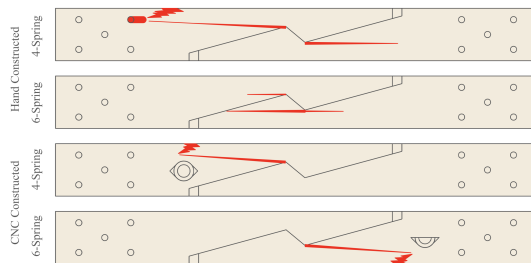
Schematic of the major crack patterns observed in the four tested daimochi tsugi joints (top to bottom: handcrafted 4-spring and 6-spring; CNC-fabricated 4-spring and 6-spring). Red lines indicate crack initiation and propagation paths from axial tension testing [18].
